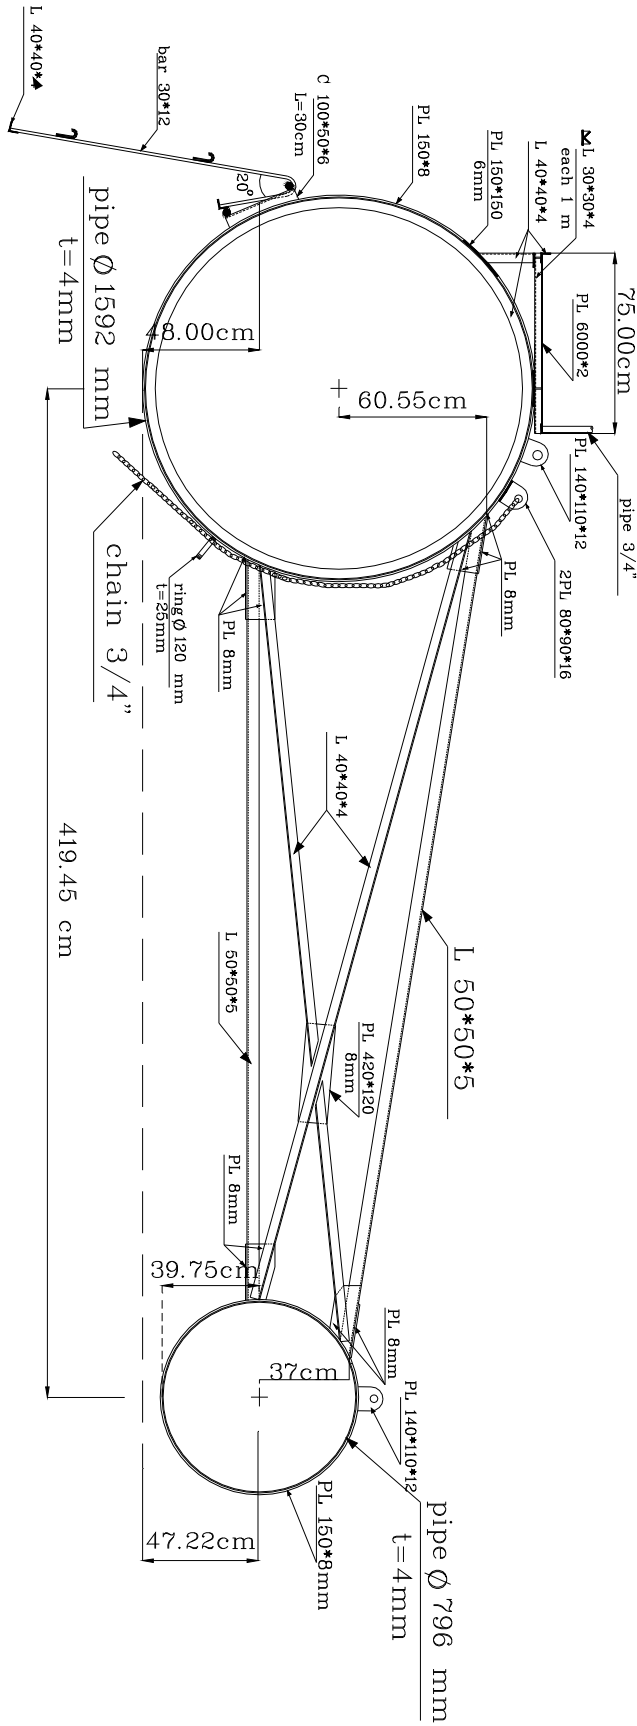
Detailed design of buoy unit in the barrier (Section elevation)
